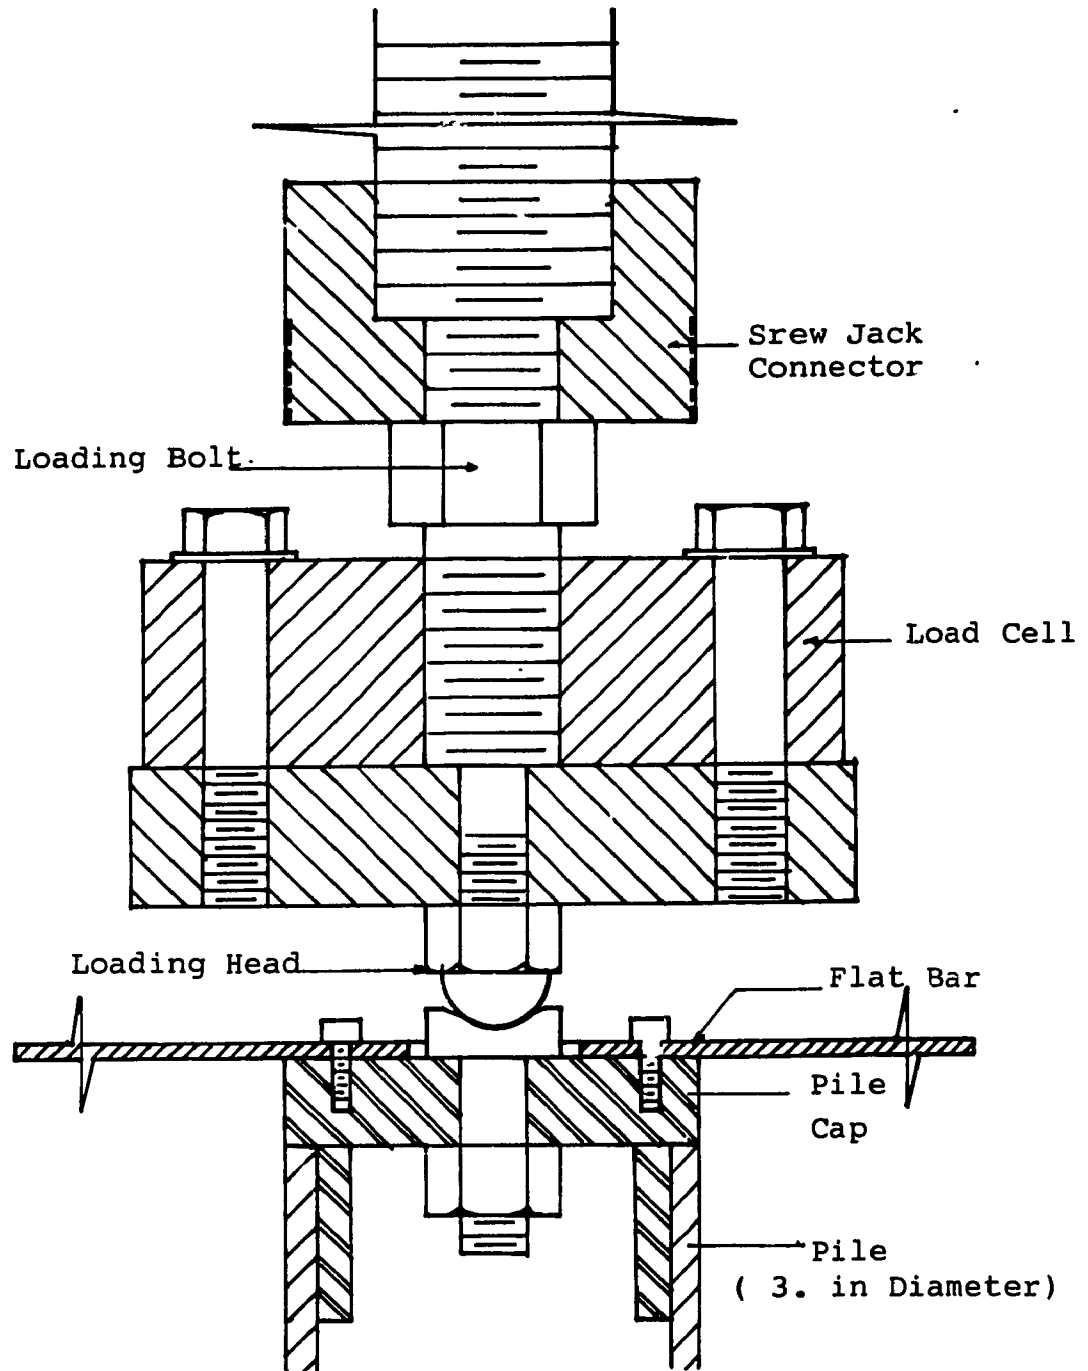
Load Test Arrangement for 3 in. Diameter Pile
